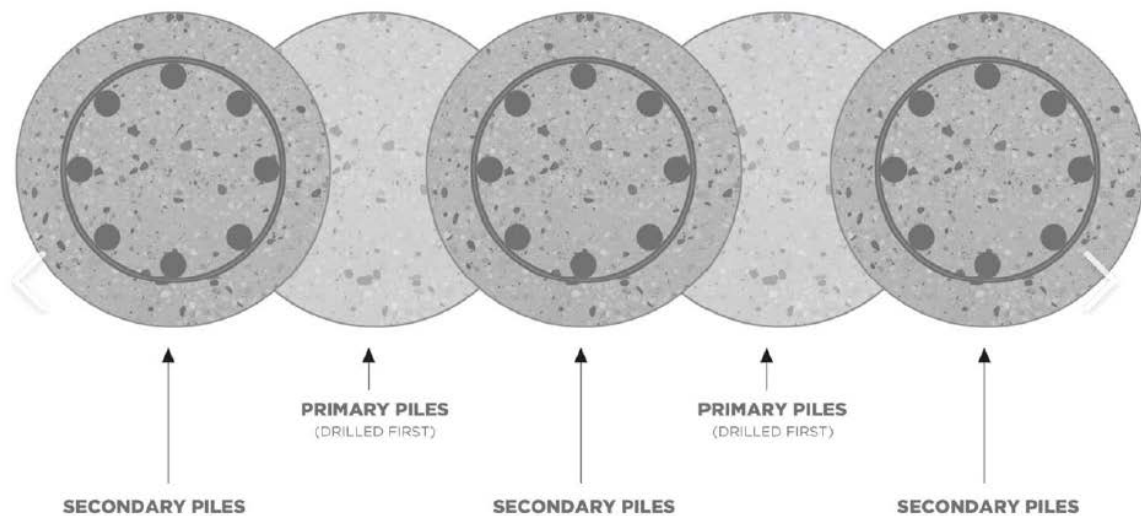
Typical layout of secant piles wall (BAM Nuttall, 2021)
